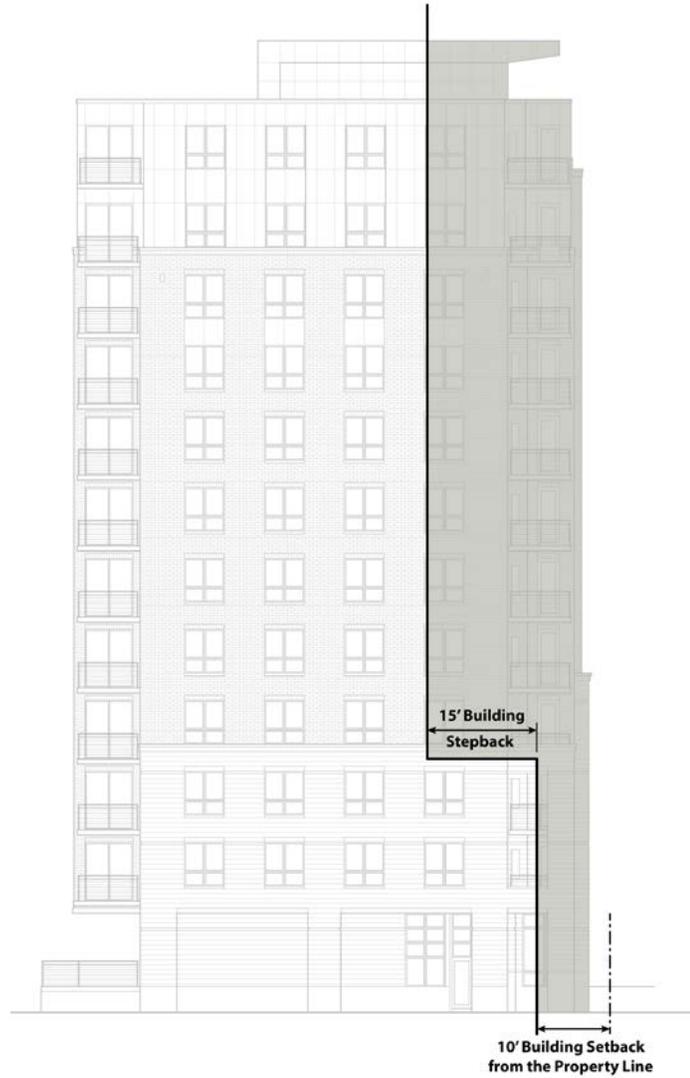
Elevations (Areas Inconsistent with Plan Are Shaded)
